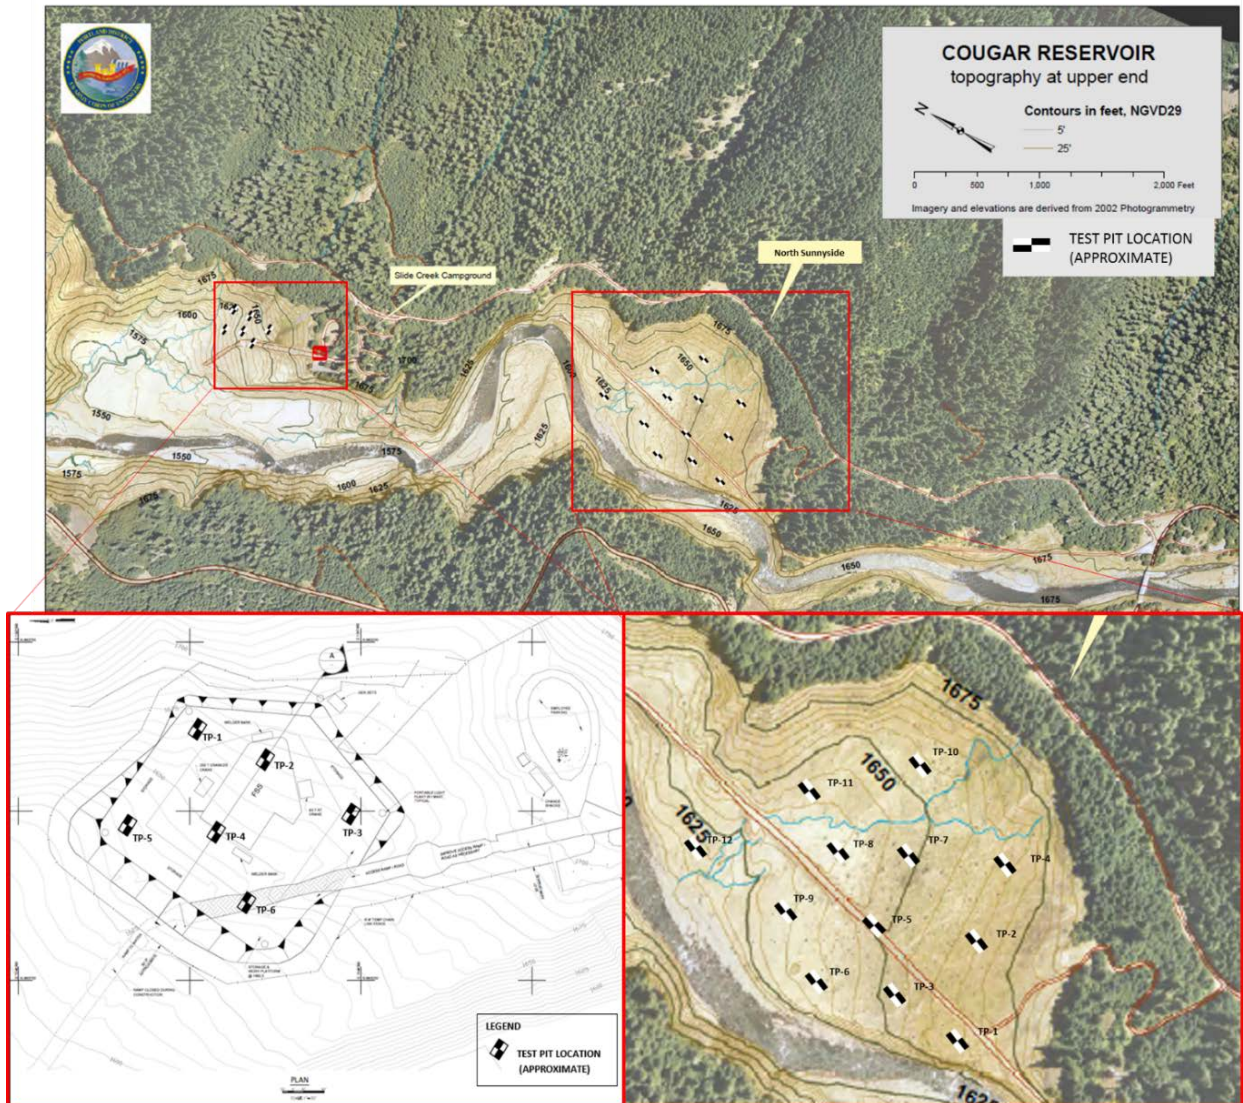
Proposed Test Pit Locations at Slide Creek Campground (left) and North Sunnyside (right)
